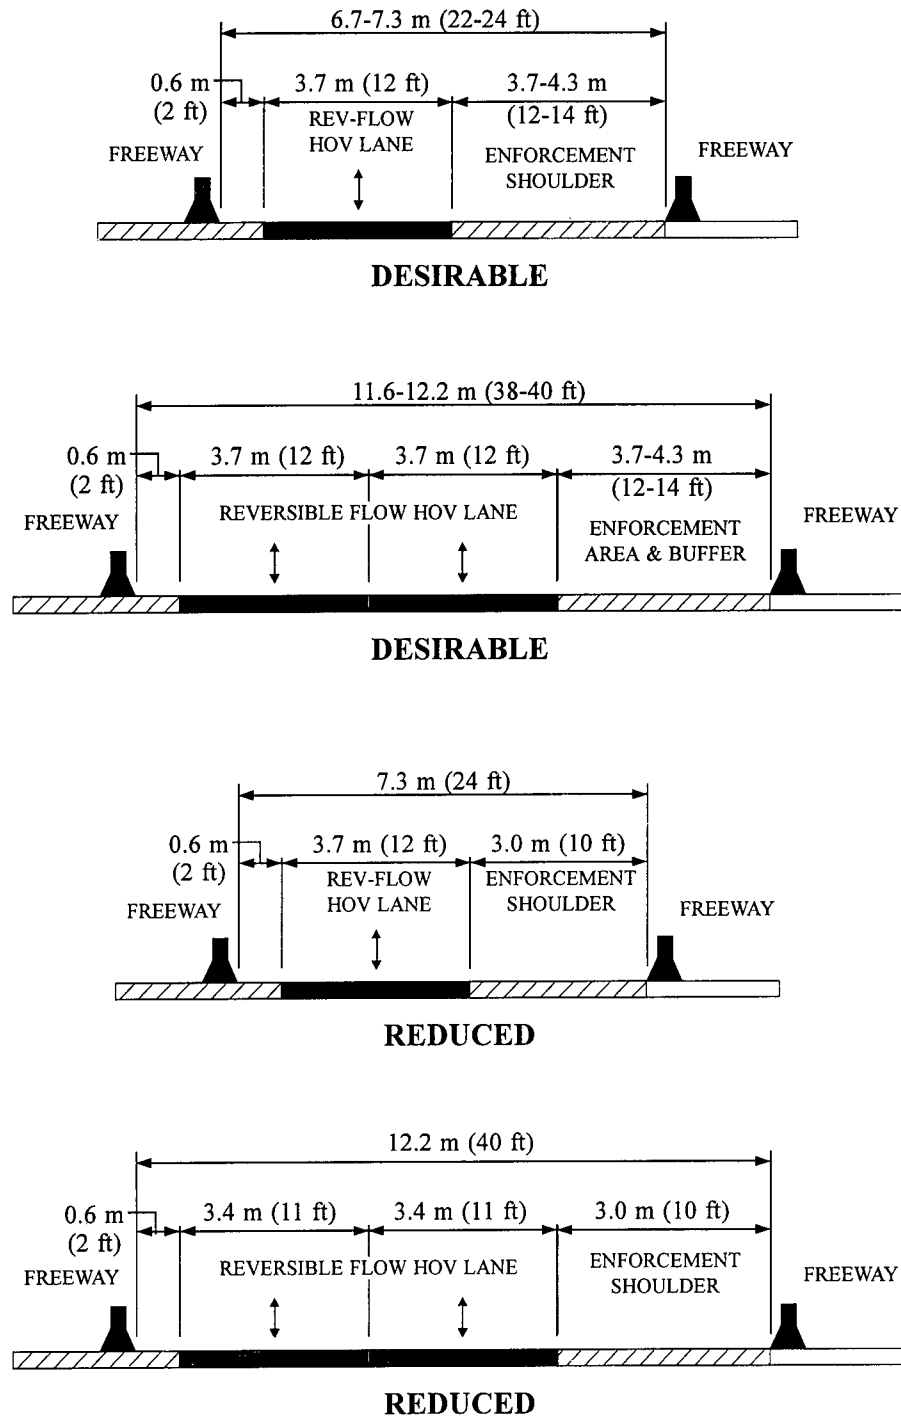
Examples of Cross Sections of Enforcement Areas Along a Reversible Barrier-Separated HOV Lane
